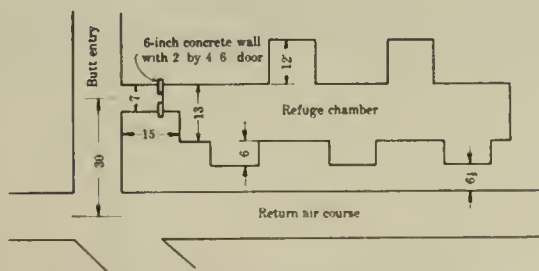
PLAN OF REFUGE CHAMBER AT EACH BUTT ENTRY IN NEW DEVELOPMENT WORK
